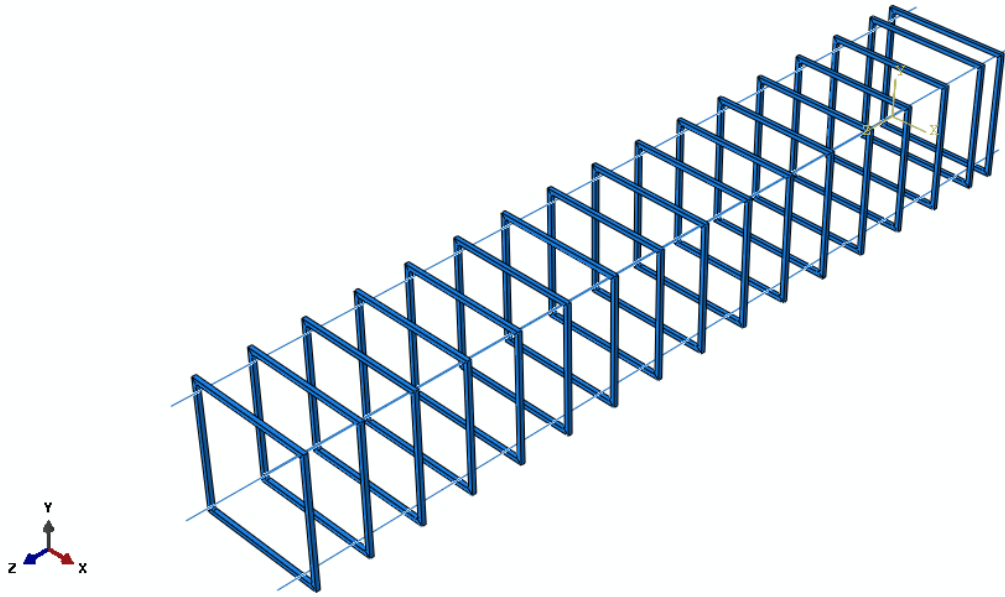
Longitudinal and stirrups before embedding in the concrete
